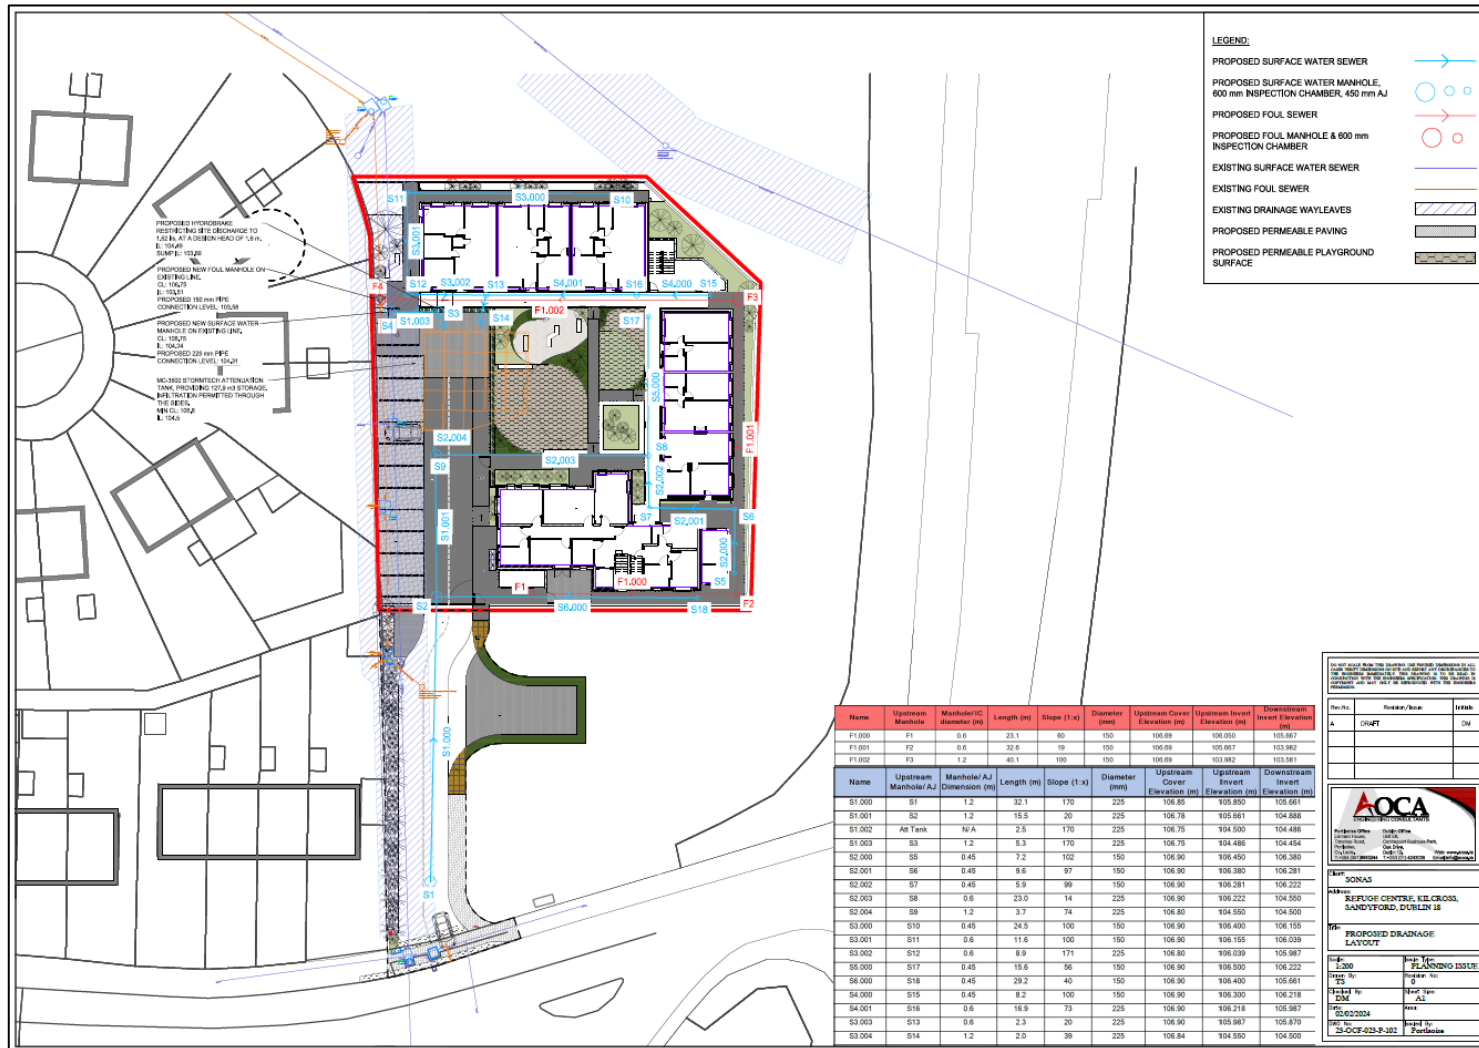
EXISTING AND PROPOSED DRAINAGE NETWORK AT THE SITE (AOCA DRG No. 23-OCF-023-P-102).
